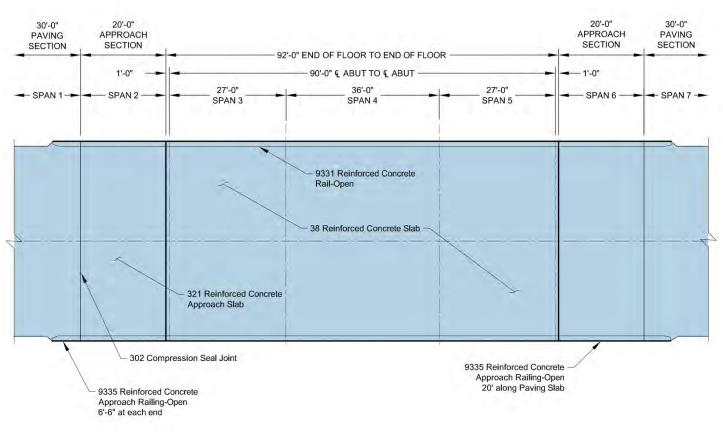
EI.24.3-2: Plan view of continuous concrete slab bridge
